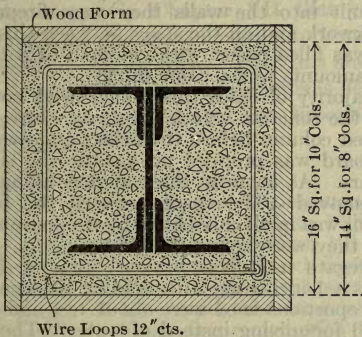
Concrete Column Casings, U.S. Post Office and Court House, Spokane, Washington.
